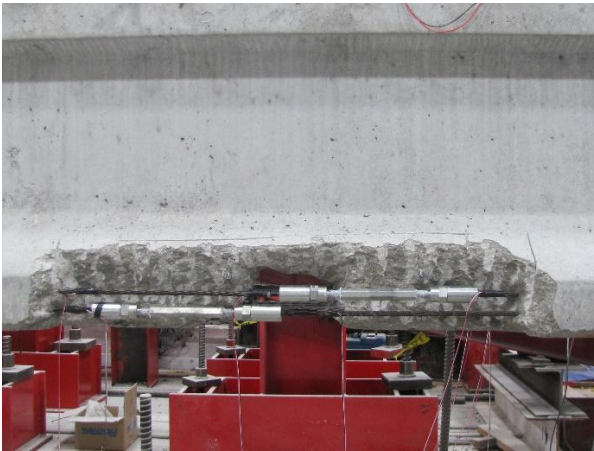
Splicing and formwork of spliced girder 17% (Girder G10)
